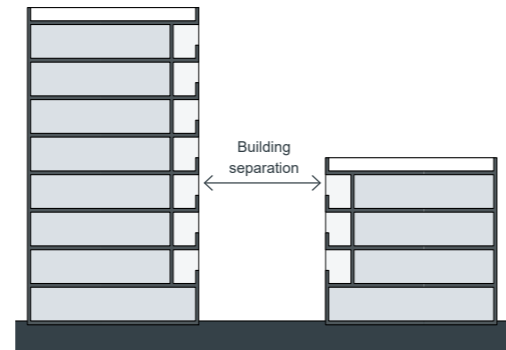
F.1 Building separation is measured from the outer face of building envelopes which includes balconies
